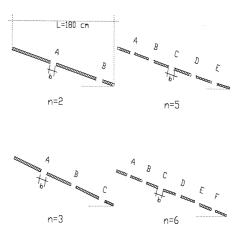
Section elevation of the "roadway model" with the lateral gutters (case of n = 2, 3, 5 and 6).
